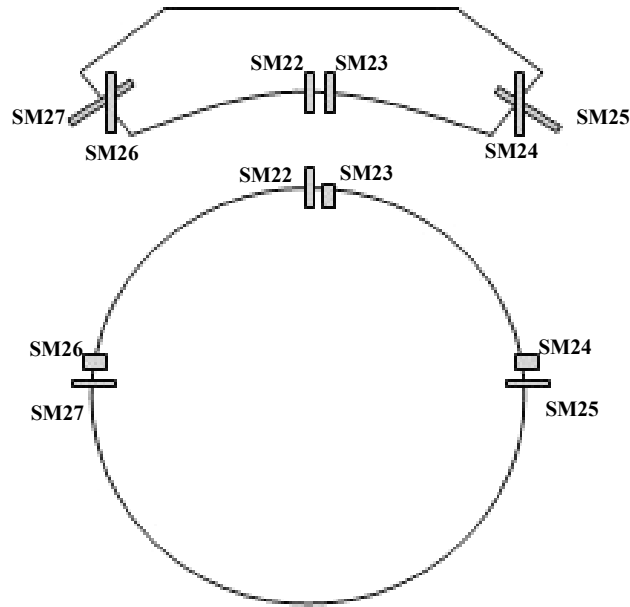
Plan and elevation view of plug with joint meter identification numbers
